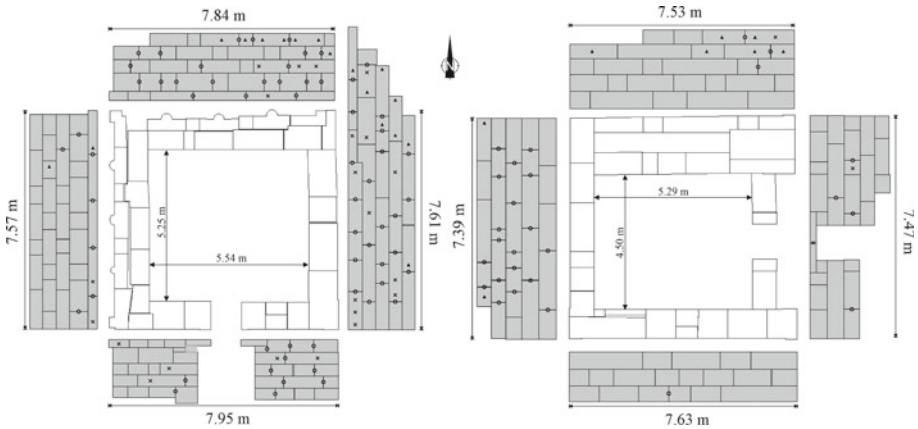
Floor plan and wall structure, as seen from outside, of the western wing room (*left*) and the western central room (*right*) of the *scene* building of the Great Theatre of Larissa. The still existing blocks of the individual walls are indicated. *Circles*: opening (*in-plane sliding*) between blocks; *crosses*: tensional fractures across block; *triangles*: rotated block (*off-plane sliding*). See also Table 1. Not all damages shown in Table 1 are visible in Fig. 4
